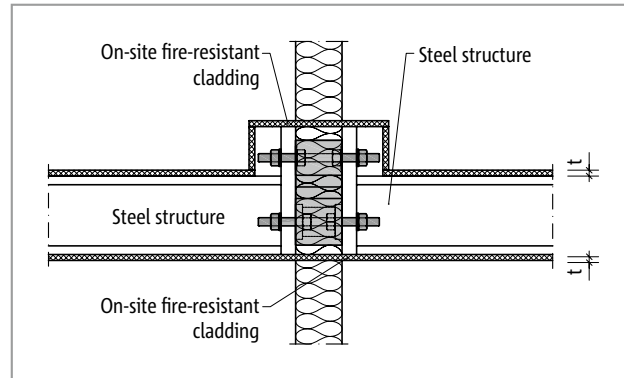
Fire protection Schöck Isokorb® T type S: On-site fire protection cladding for overlaying face plates; section
